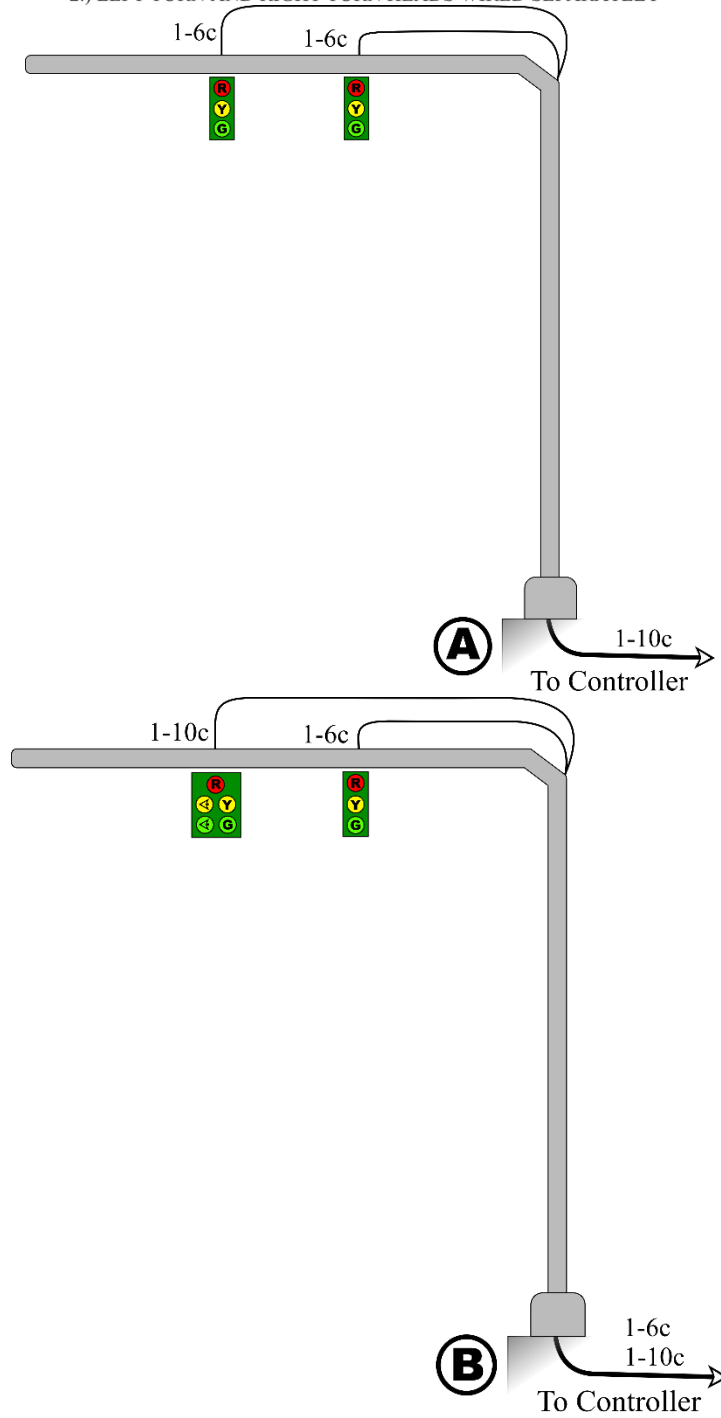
Typical Mast Arm Signal Wiring: Examples A & B
